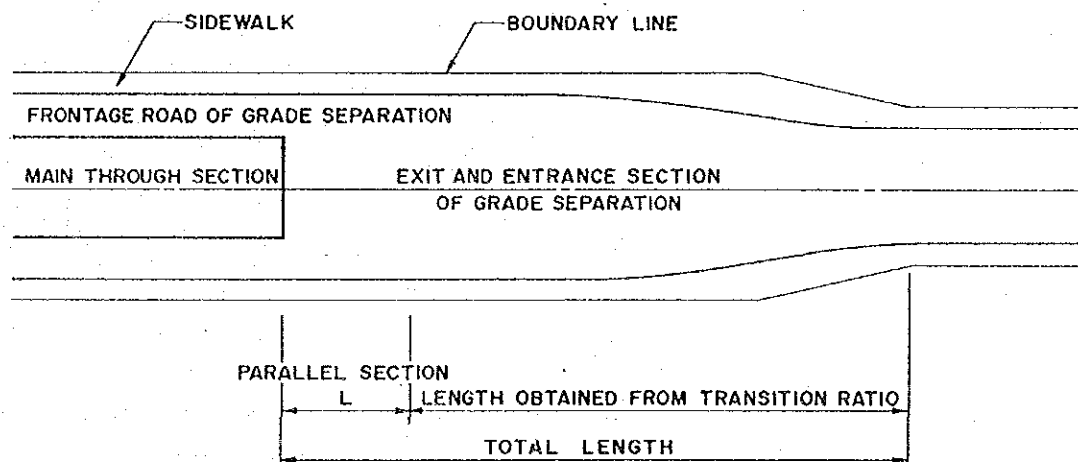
Transition Runoff at the Exit and Entrance Section of Grade Separation
